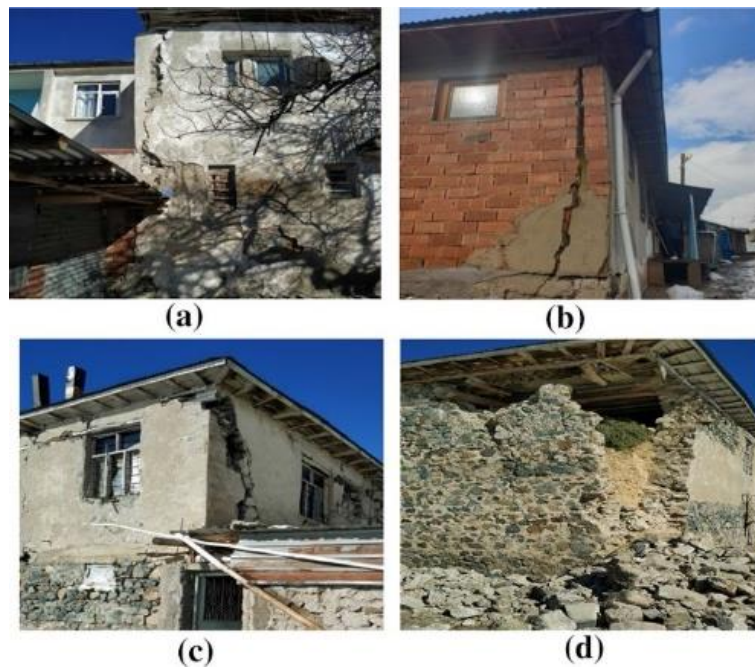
Corner failure mechanisms in masonry structures in the town of Sivrice [16]
